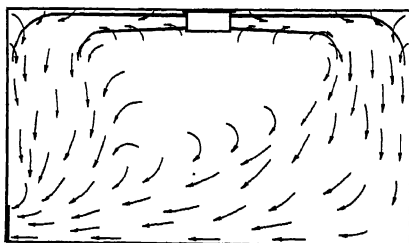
ELEVATION VIEW CEILING SUPPLY OUTLET WITH RETURN WALL OUTLET
